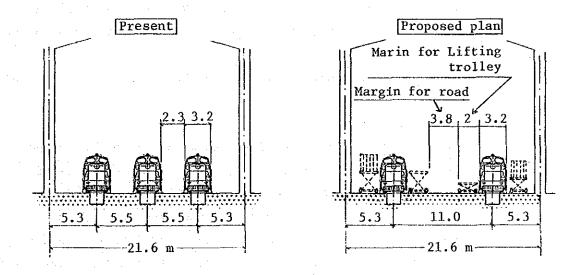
Cross Sectional Views of Present Body Shop and Proposed Plan
